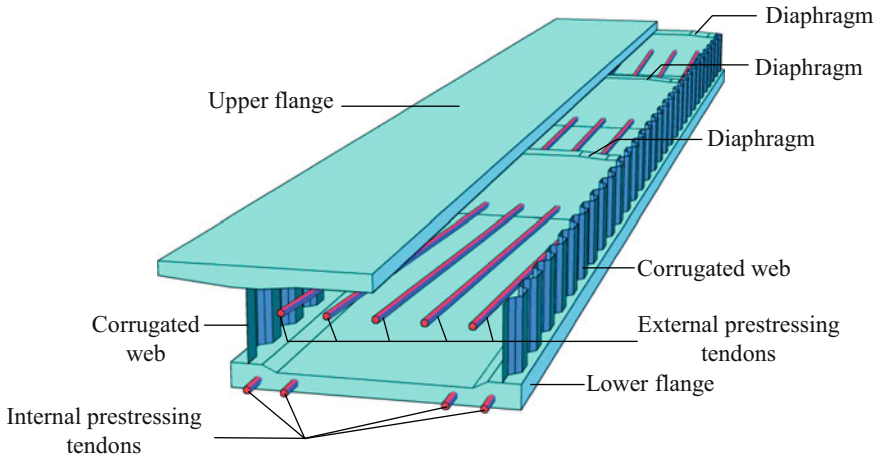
Configuration of one prestressed concrete bridge with corrugated steel webs
